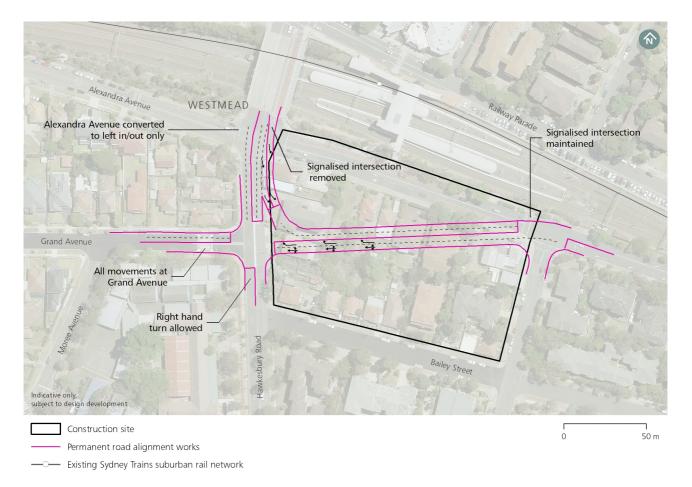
Permanent changes to the road network around Westmead metro station construction site (indicative only)
